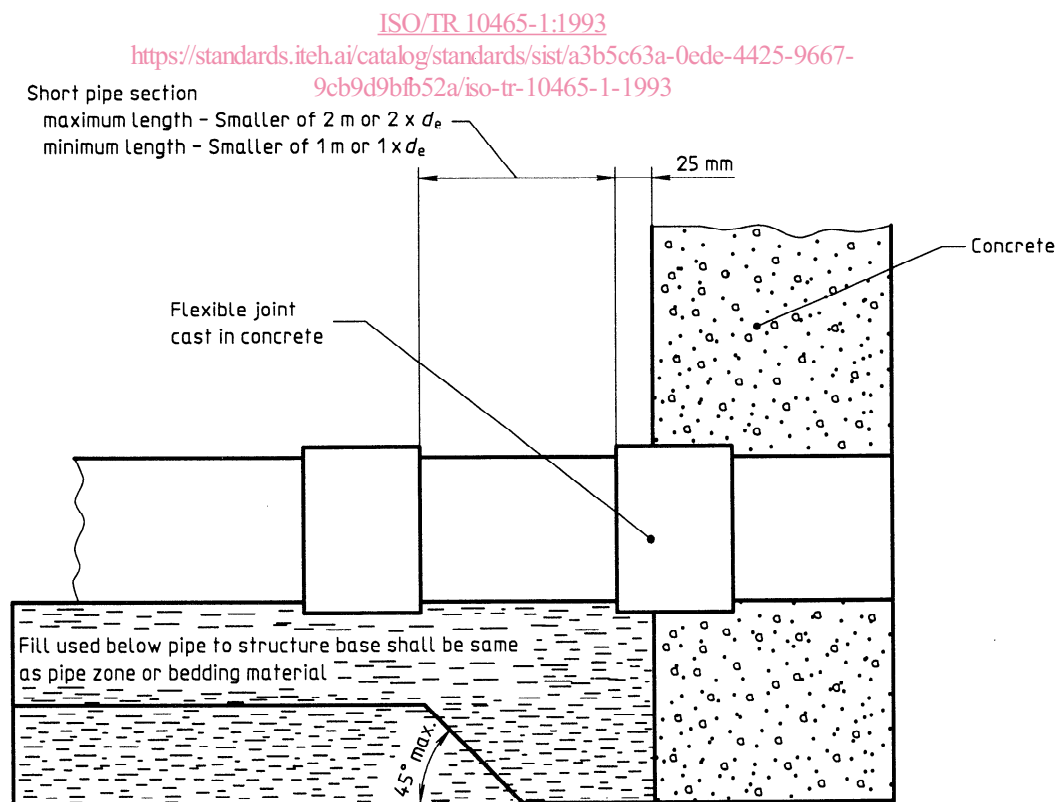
Connection at a rigid structure — Flexible joint cast in concrete
